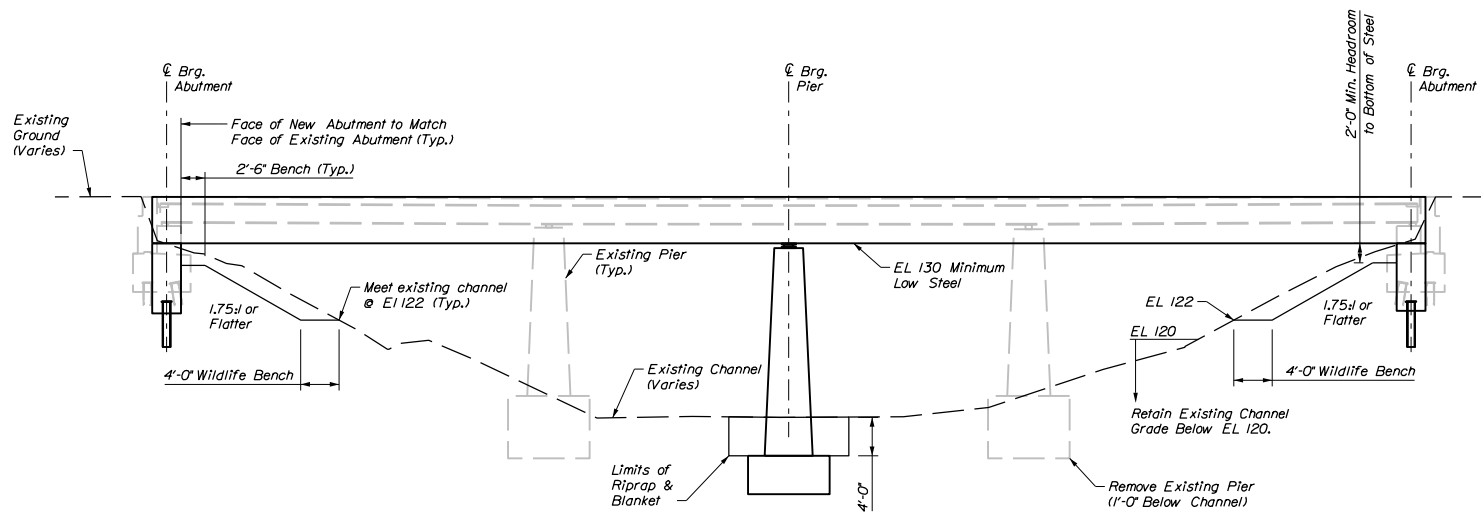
ASSUMED BRIDGE ELEVATION SCHEMATIC
